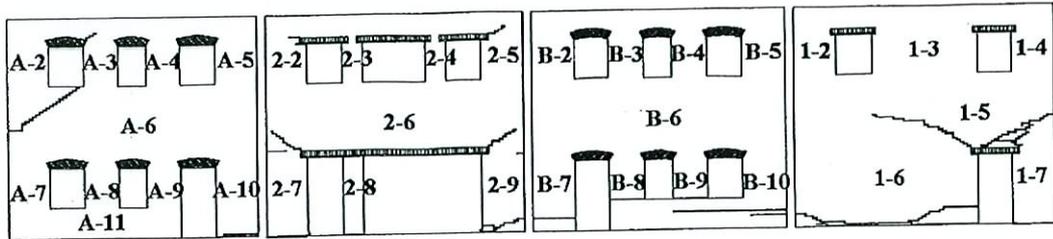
Final crack pattern for test structure after in-plane wall tests parallel to Walls 1 and 2
